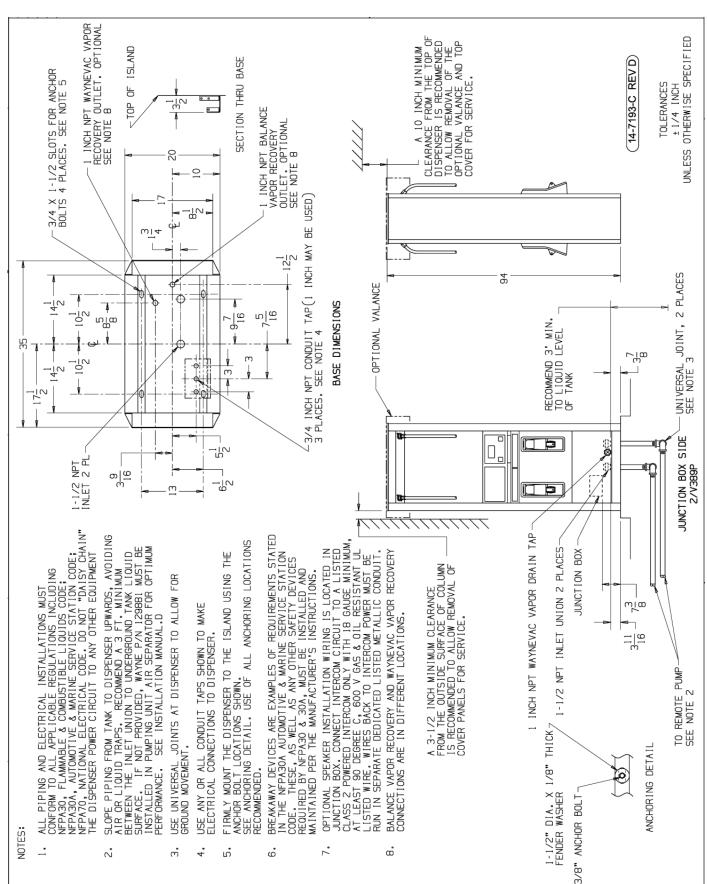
14-7193-C Installation Instructions - 4/V389P (Suction)
